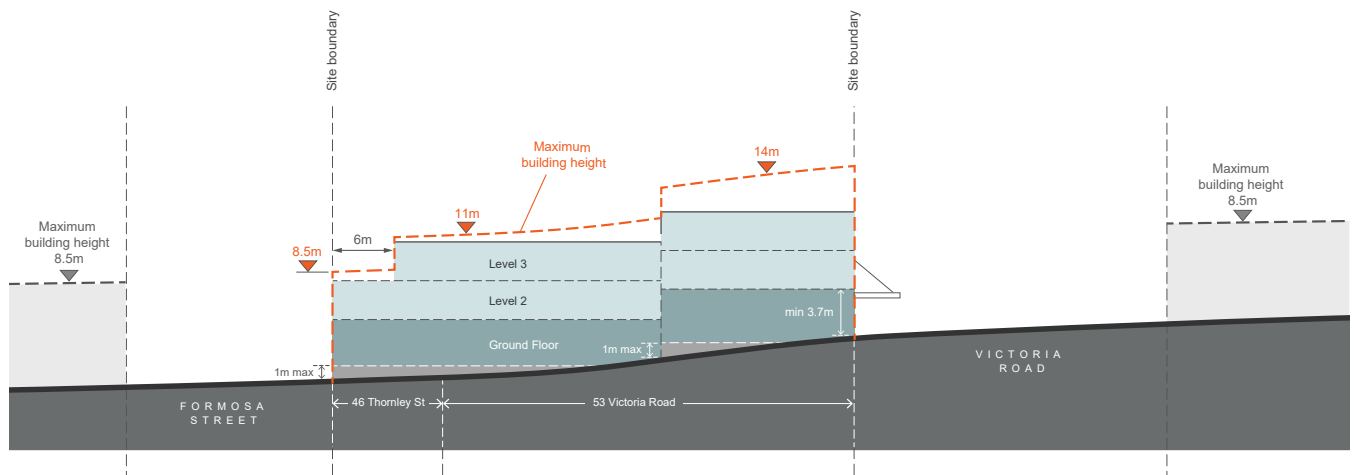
Area 'H' Elevation 3 Thornley Street
